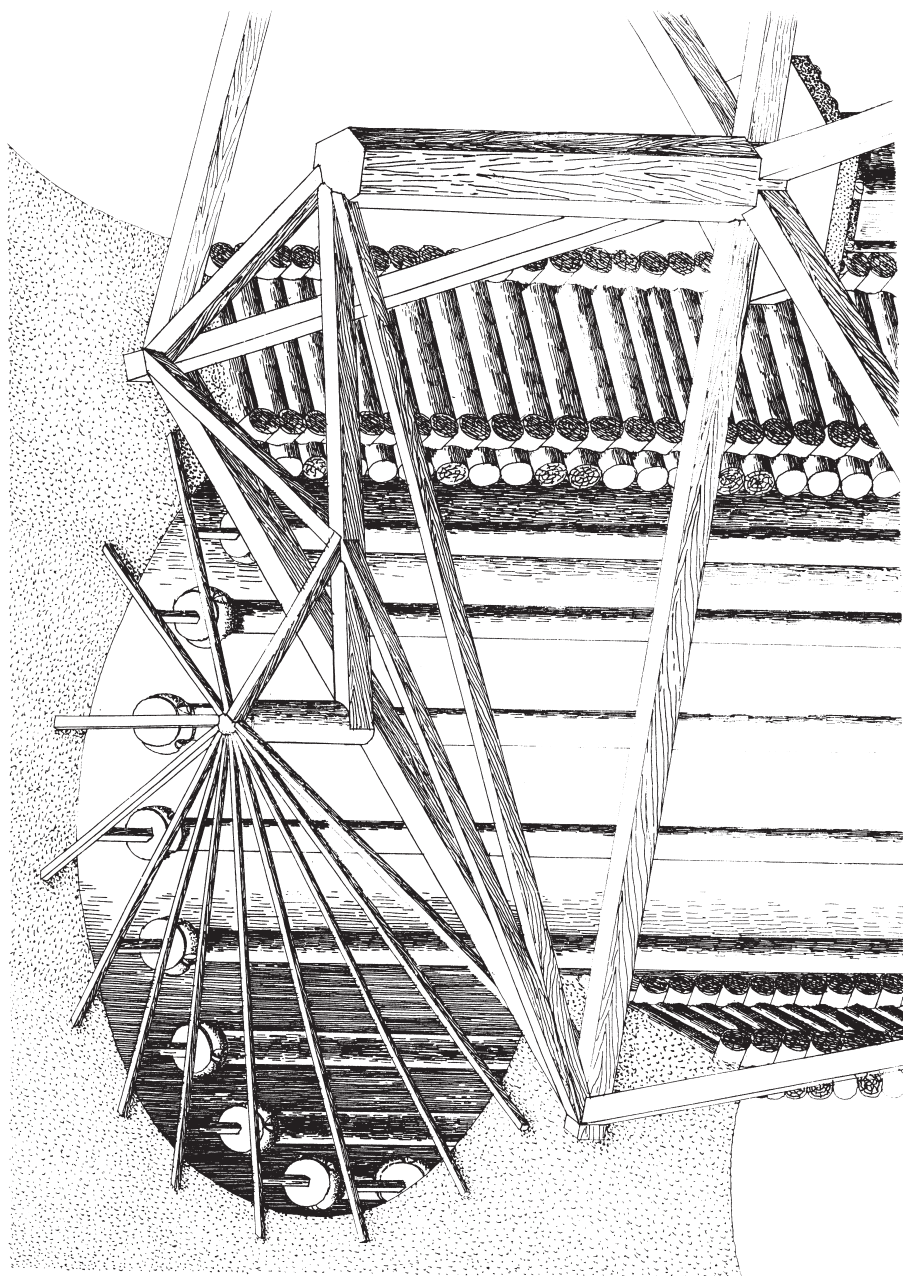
Reconstruction of roofing system in central area of temple and apse.
